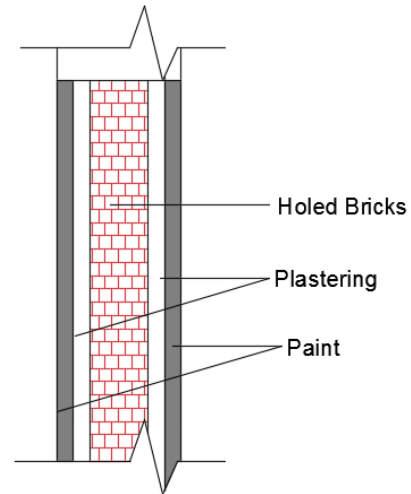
Insulated holed brick wall section cut, Source: Authors
